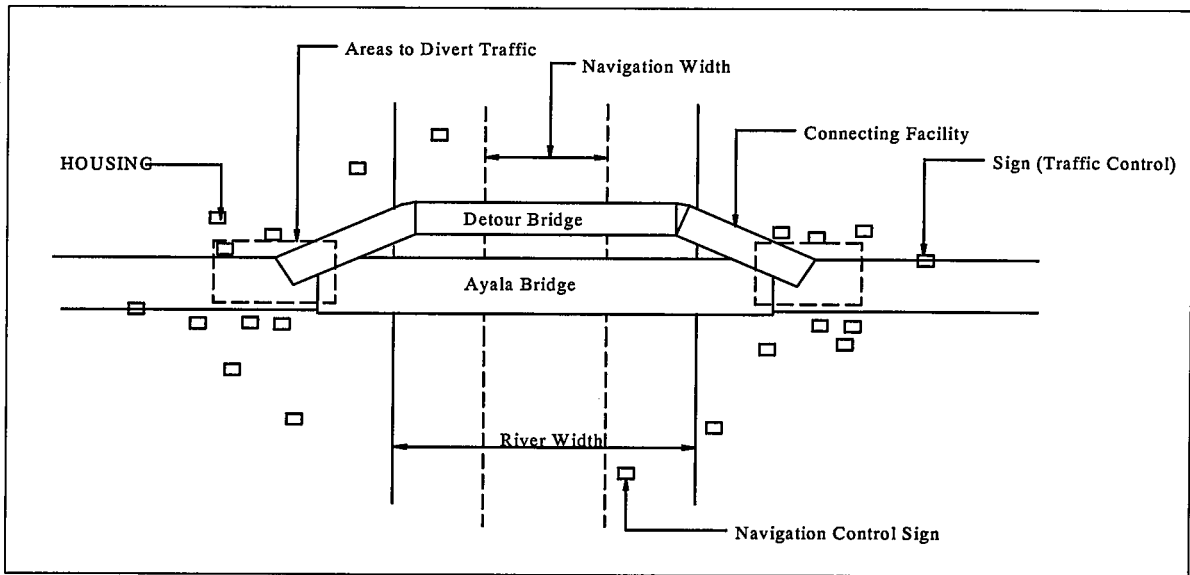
Traffic Management Plan under Improvement Works
